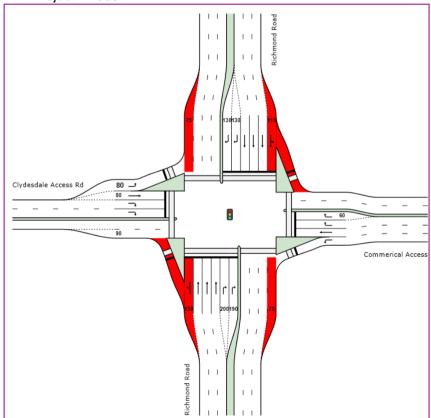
Richmond Road/Clydesdale Access Road intersection layout With Project
